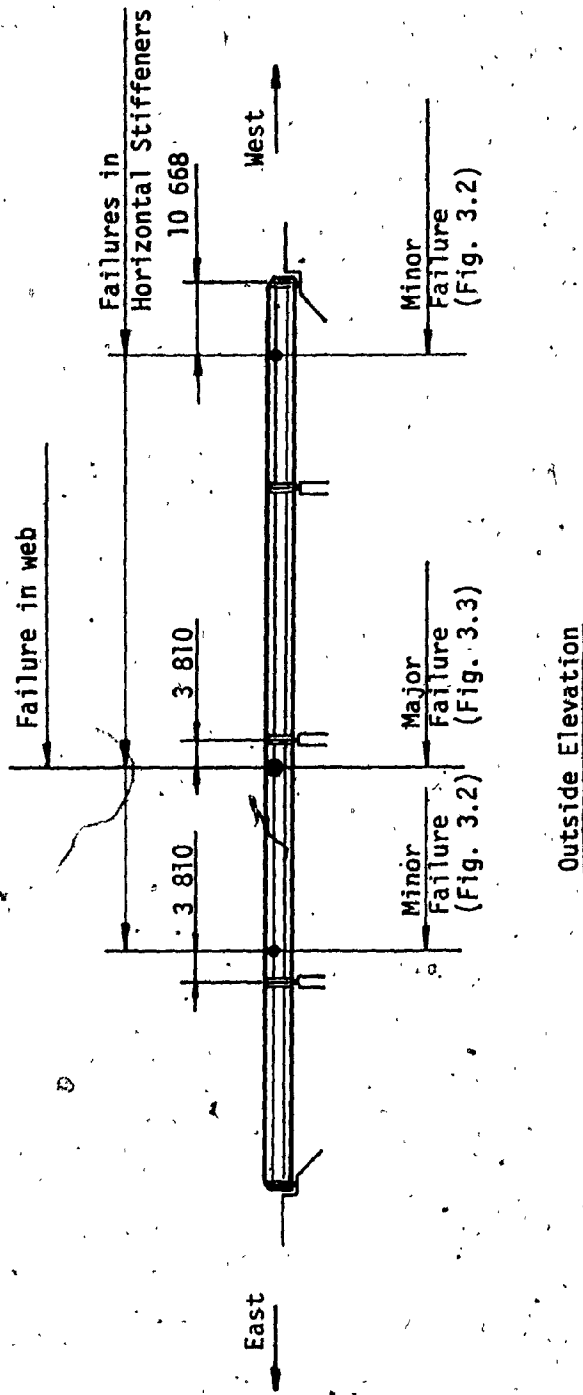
FAILURE LOCATIONS, (NORTH GIRDER)
